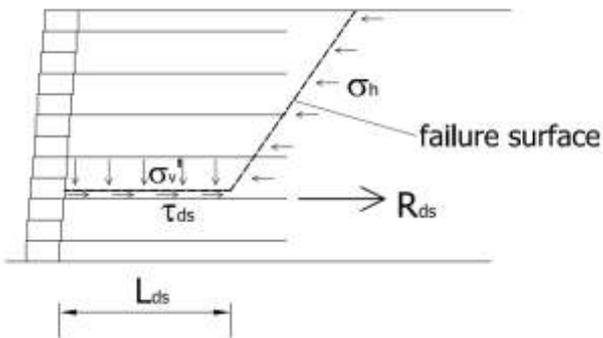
Example of horizontal sliding analysis of a reinforced fill structure
